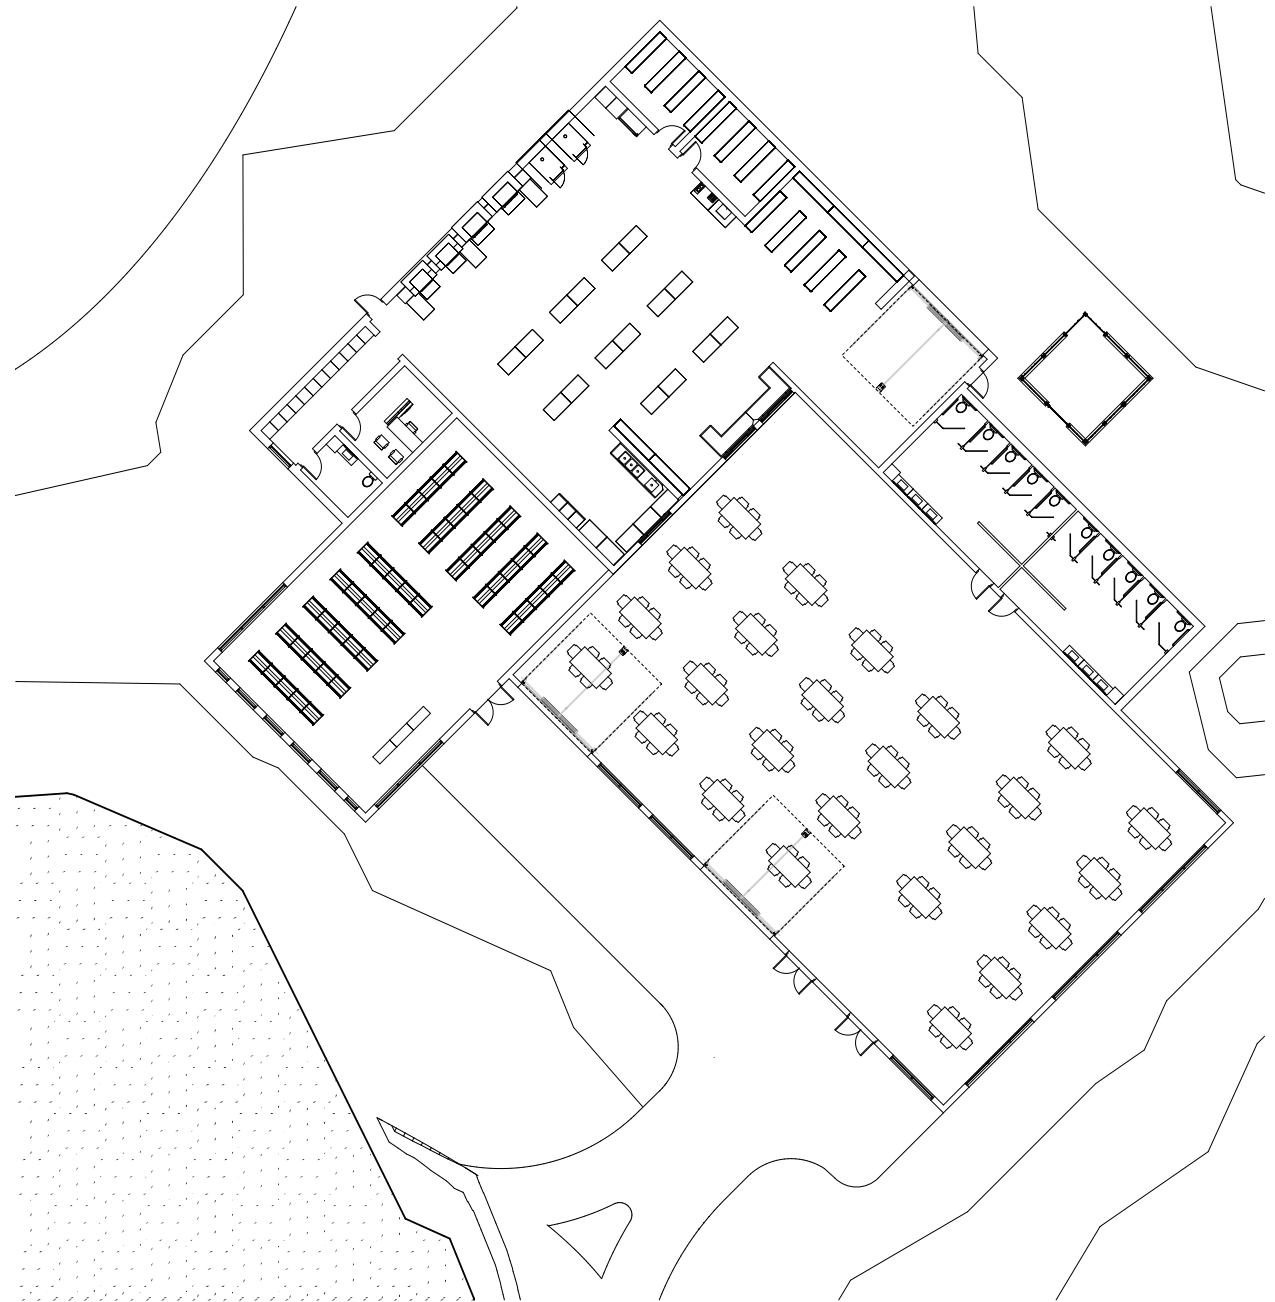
NOURISHMENT BUILDING FLOOR PLAN
